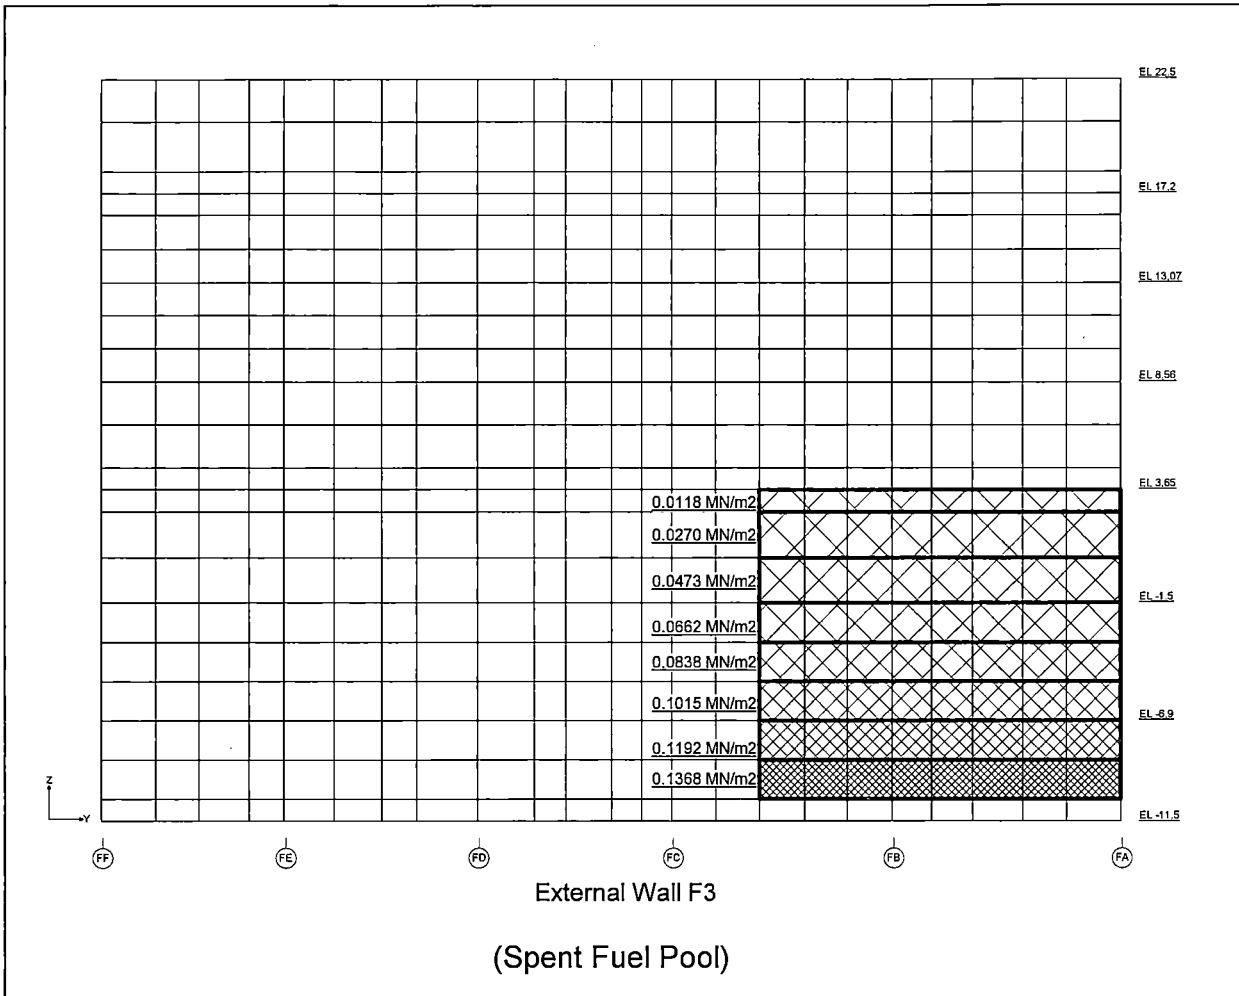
Hydrostatic Loads on the F3 External Wall
